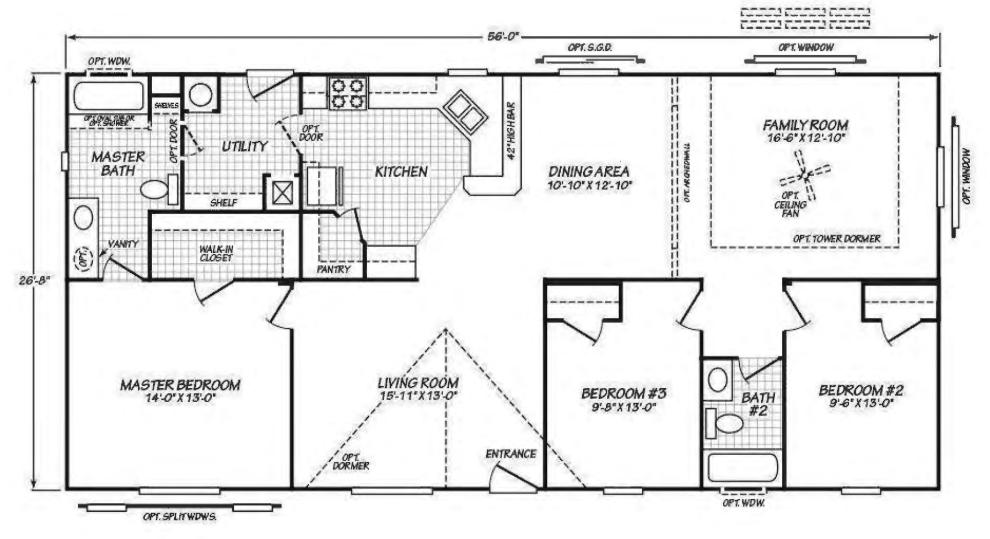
Staff Housing Expansion Modular Home Floor Plan
